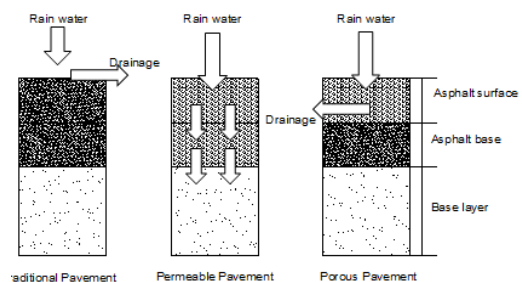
Comparison between permeable and traditional pavements (Lin, 2003)
